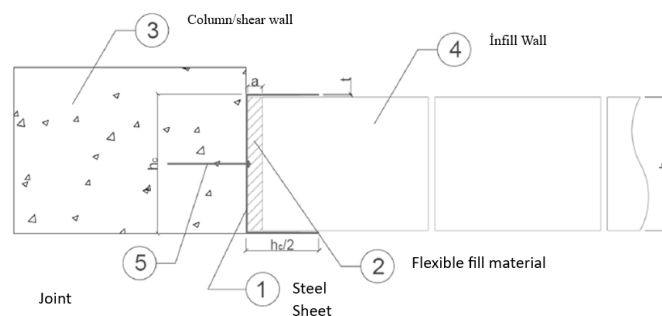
Connection of infill walls to steel columns by leaving a flexible joint (TBEC 2018)
